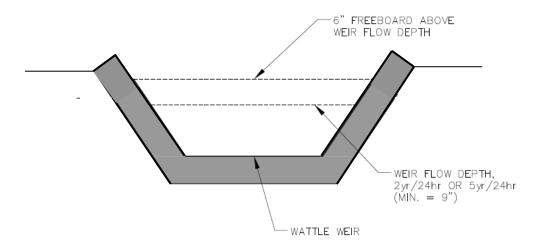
Cross sectional view of wattle installed in ditch
